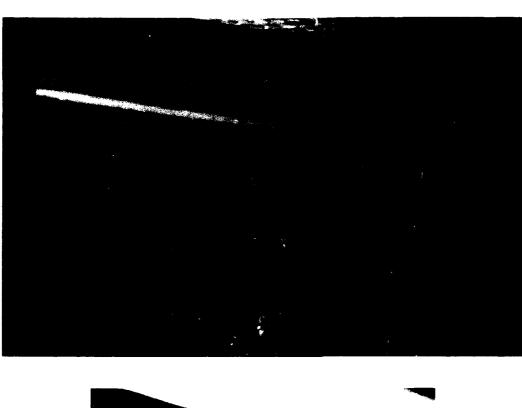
Below bottom of casing @ 66.8'. (3 of 3)
